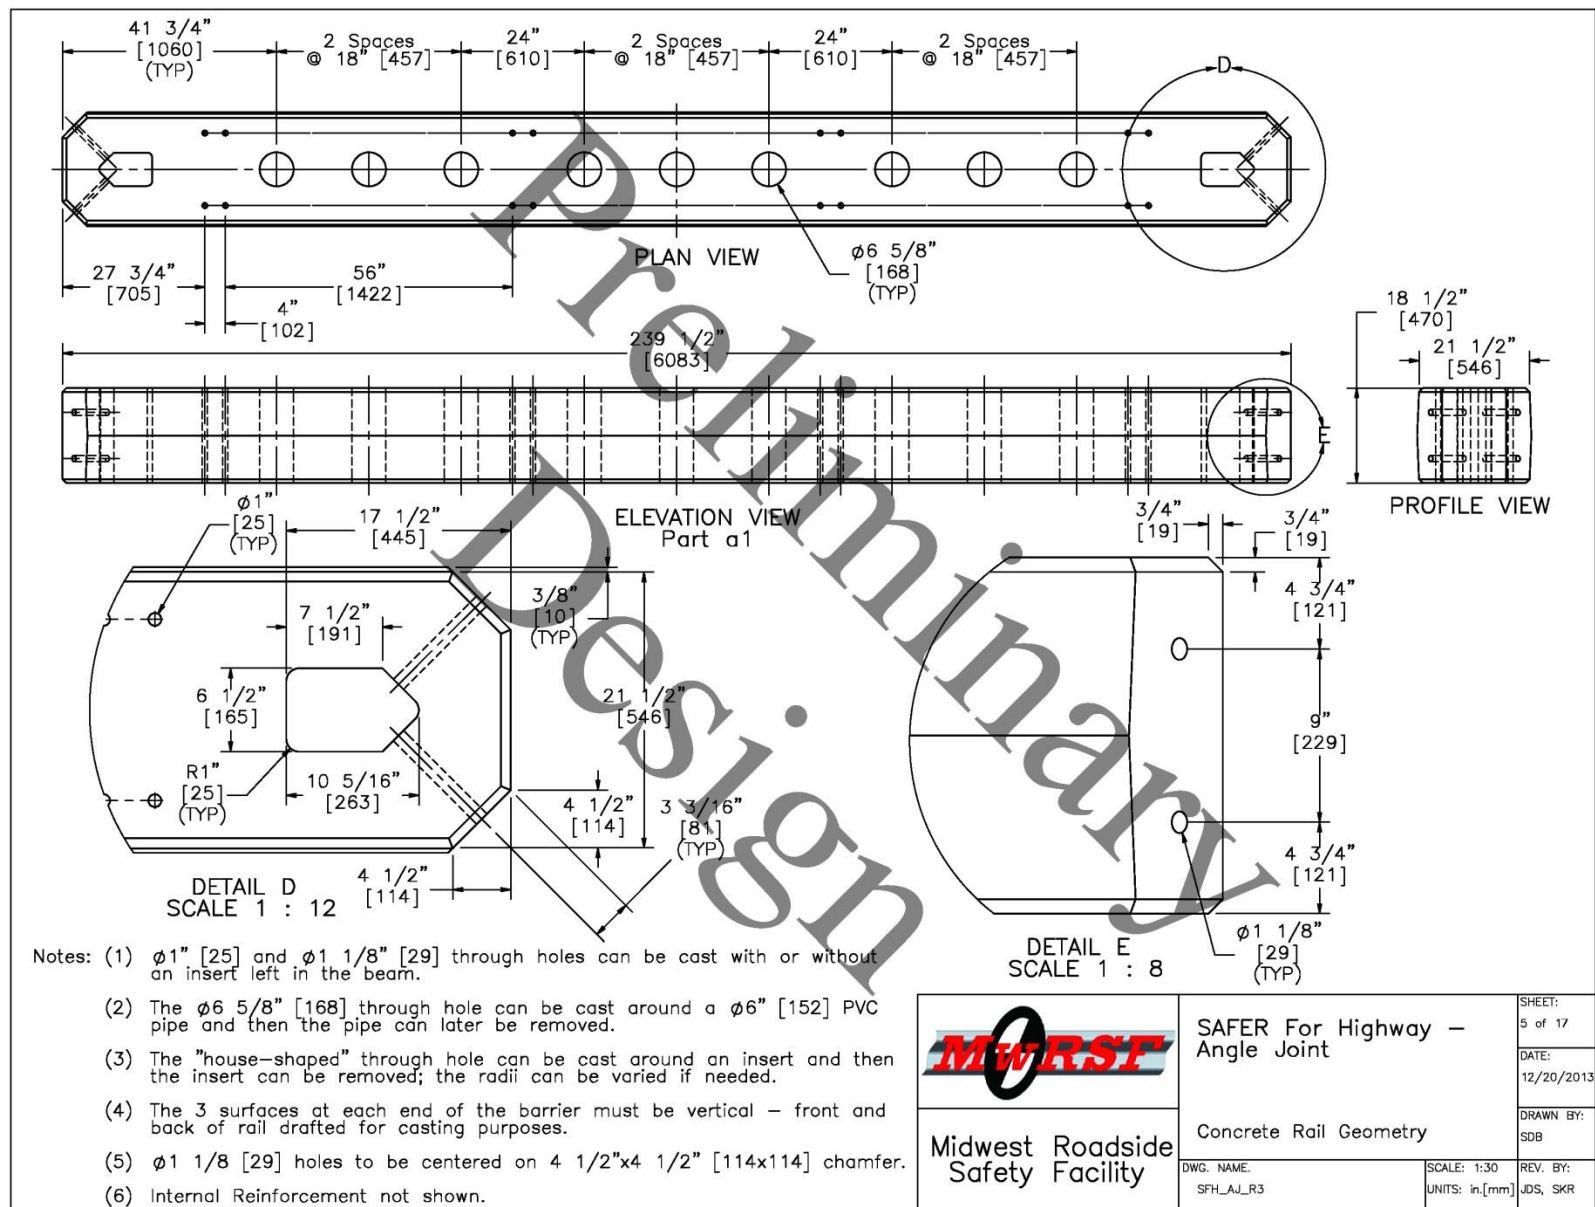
Preliminary Barrier Design, Concrete Rail Geometry
